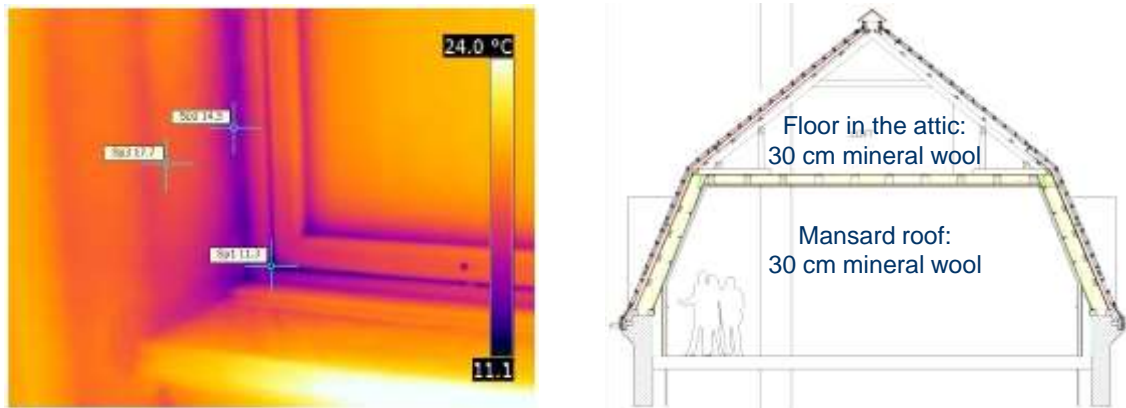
Left: Thermal photography of window in the mansard roof before retrofitting. Photo: H. Masch. Right: Cross-section showing additional insulation of the mansard roof and the floor in the attic.
